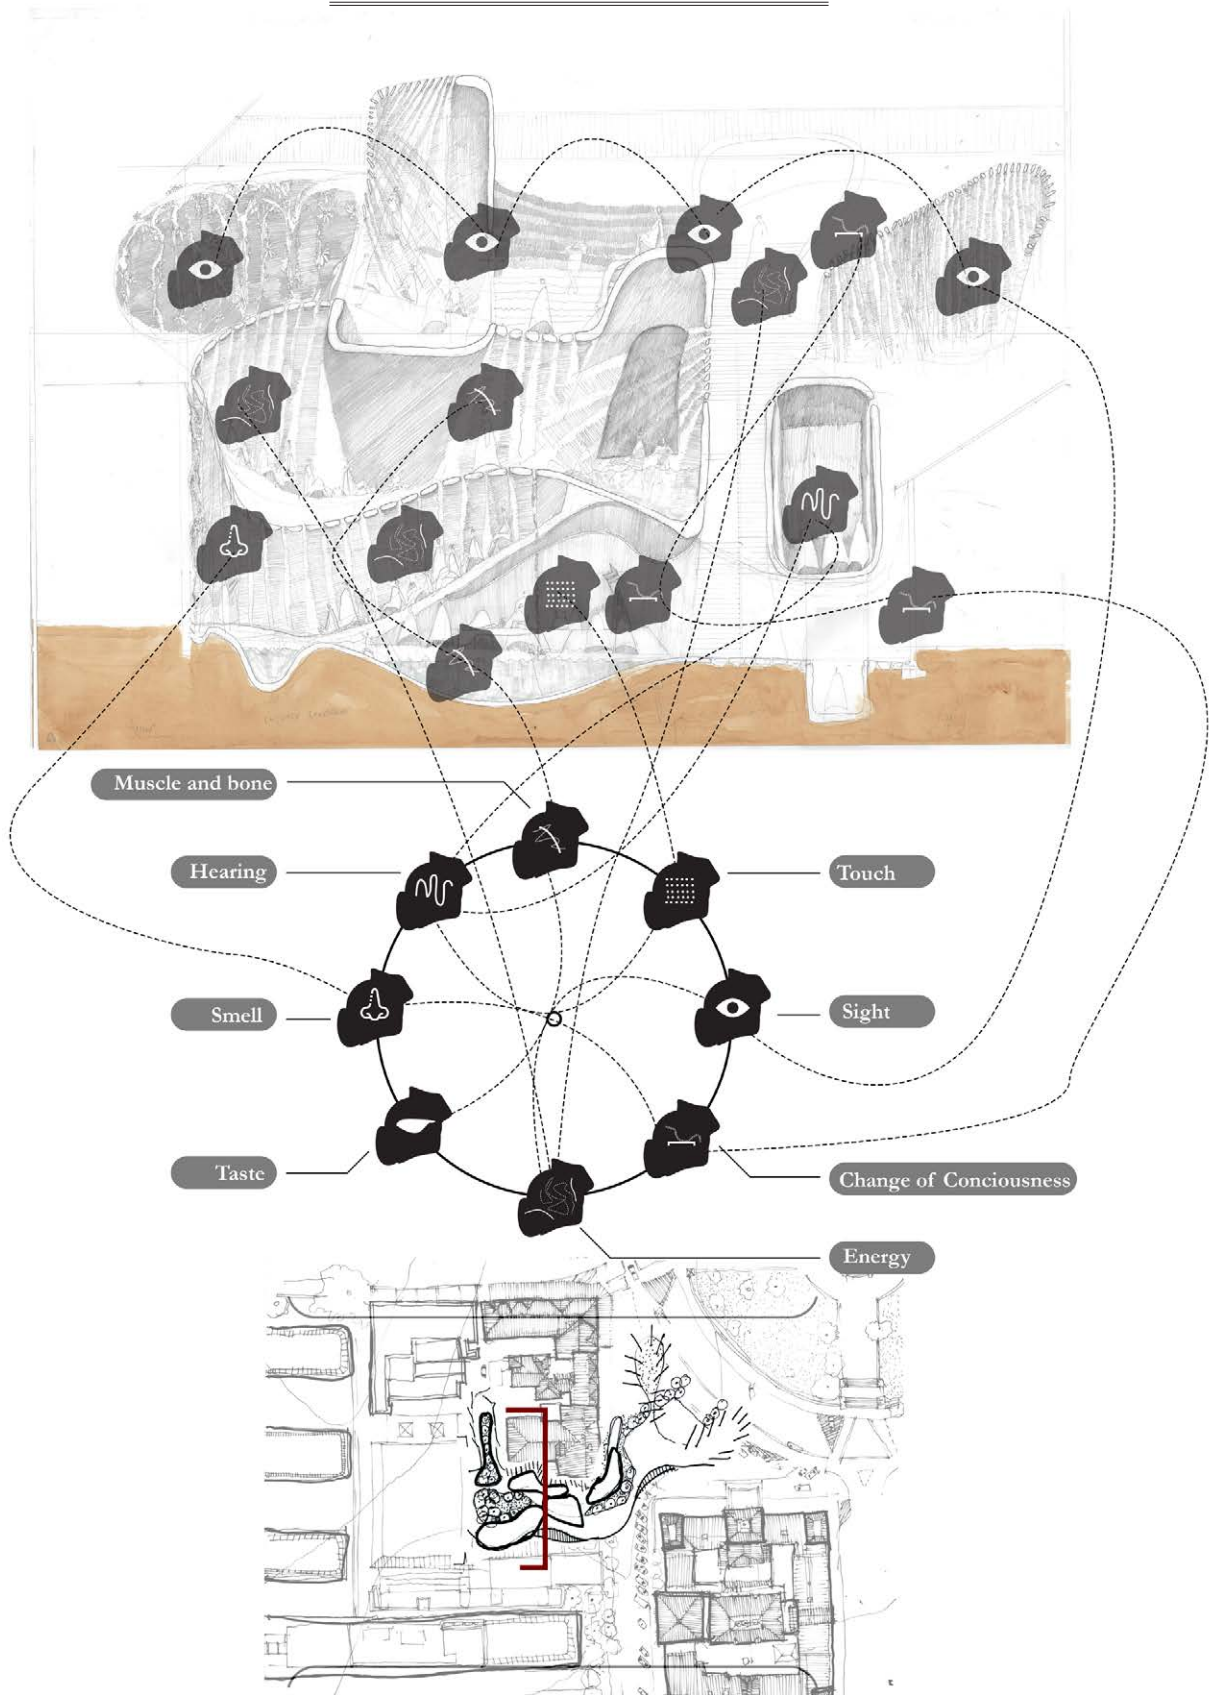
Site plan depicting potential position of building on site (Author, 2018)
